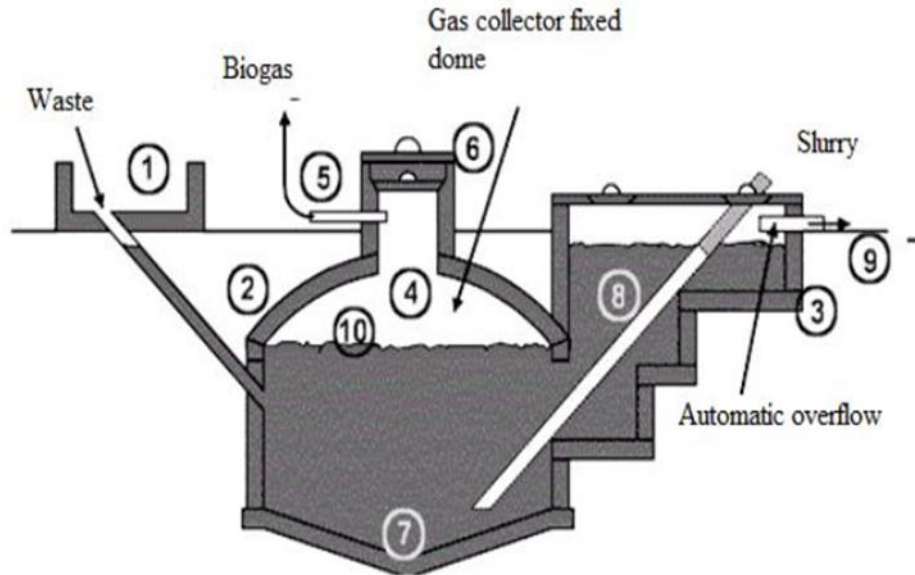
Fixed dome plant Nicarao design: 1. Mixing tank with inlet pipe and sand trap, 2.Digester, 3. Compensation and removal tank, 4. Gasholder, 5. Gas pipe, 6.Entry hatch, with gastight seal, 7. Accumulation of thick sludge, 8. Outlet pipe, 9. Reference level &10. Supernatant scum, broken up by varying level [28]
